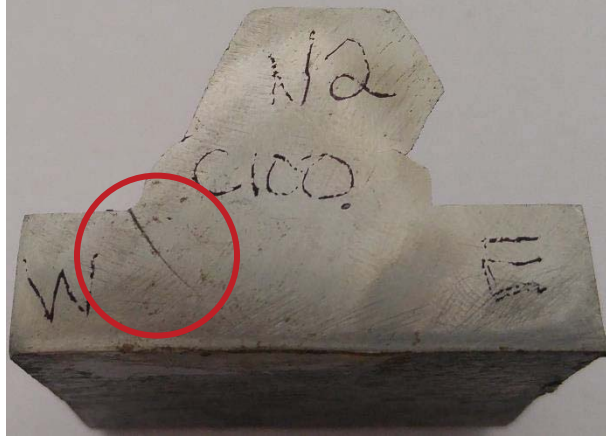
Cross-sectional cut made longitudinally through Stud N2 in Specimen C100.
